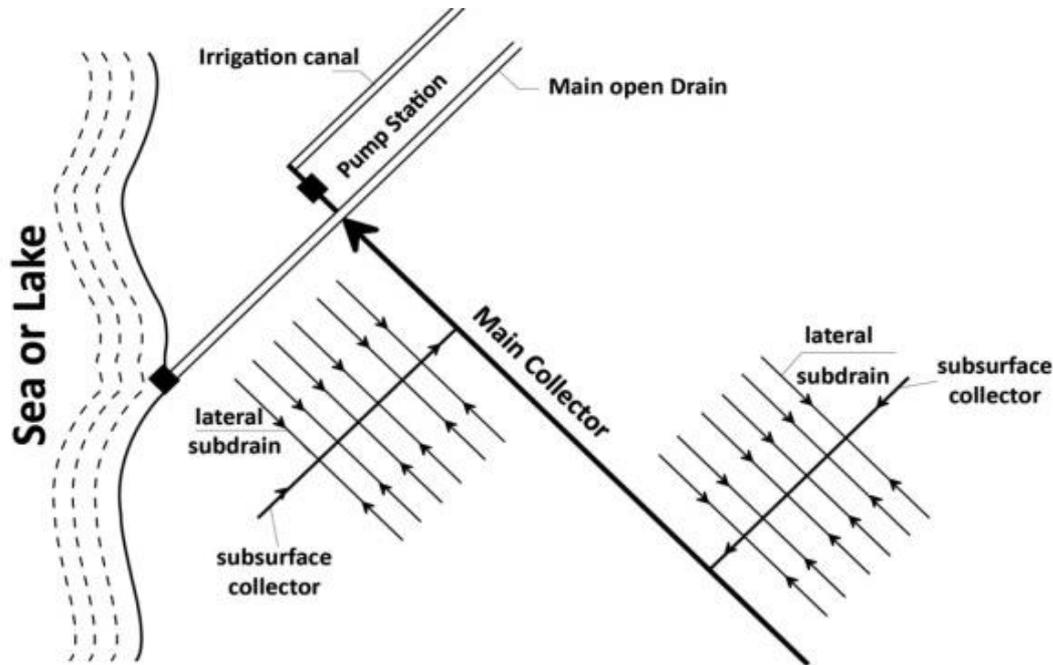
Schematic layout of a subsurface drainage system with collectors and main drain leading to the disposal outlet
